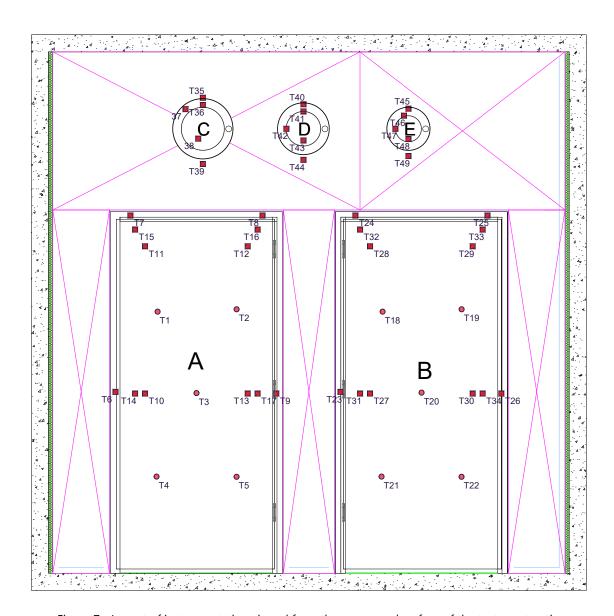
Layout of instrumentation viewed from the unexposed surface of the test construction
